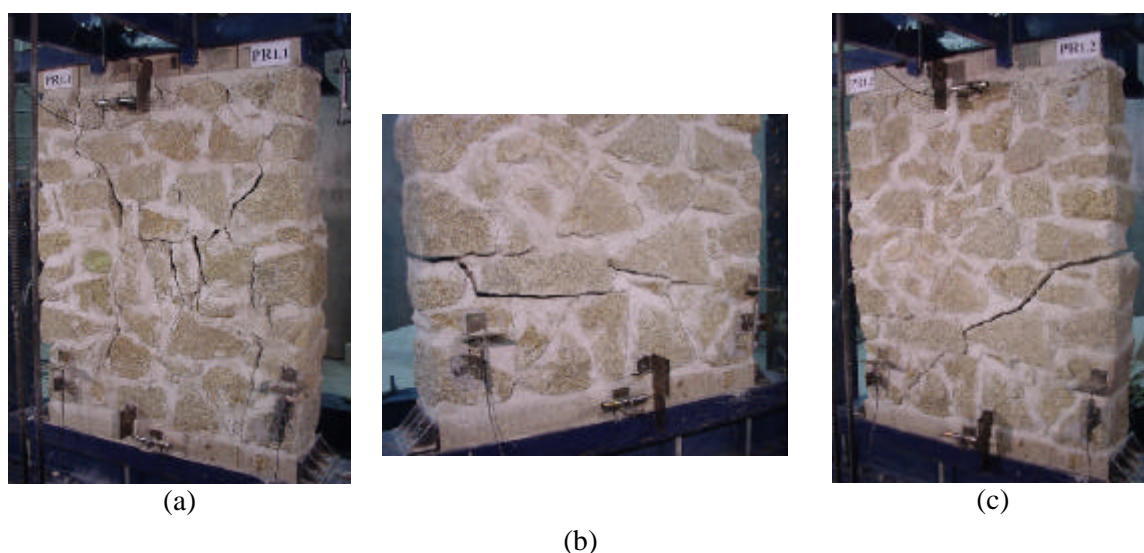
Failure mode and collapse of the walls WR.100; (a) crack pattern of the wall WR1.100; (b) and (c) crack pattern of the wall WR2.100
